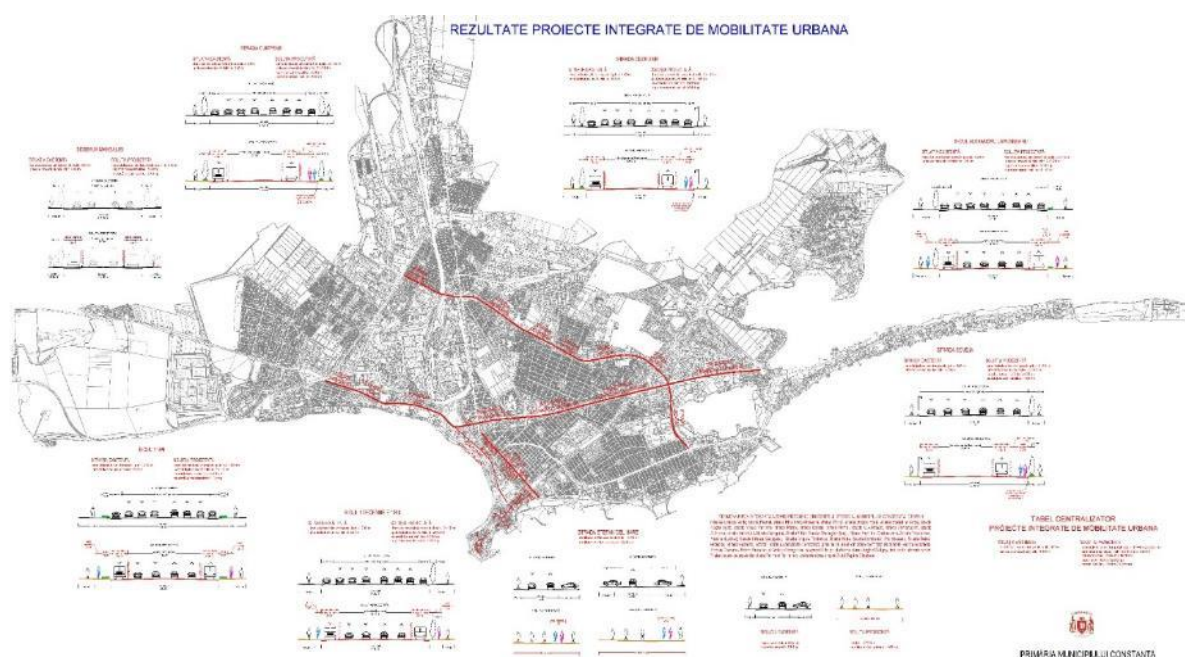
Constanta's short-term Plan for road infrastructure redesigning
